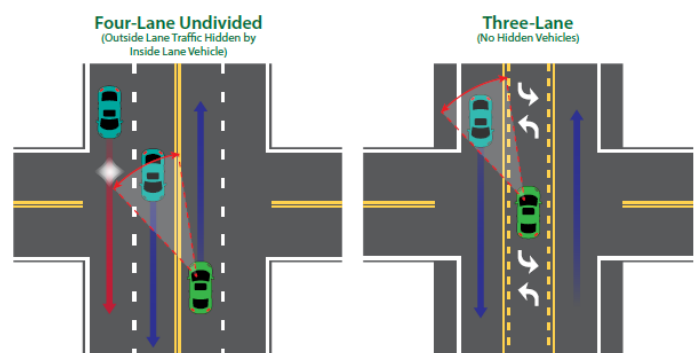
Major-Street Left-Turn Sight Distance for Four-Lane Undivided Roadway and Three-Lane Cross Section
